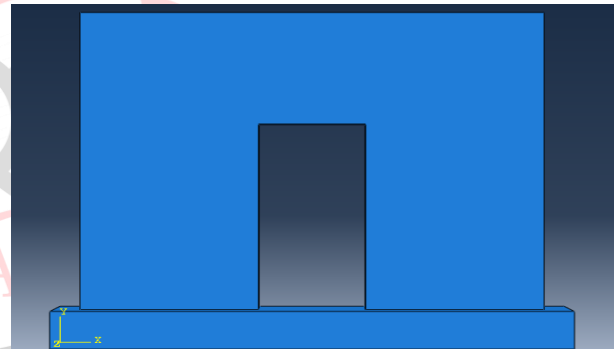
Model 3 Shear wall with size of opening 2.5 m x 1.2 m
